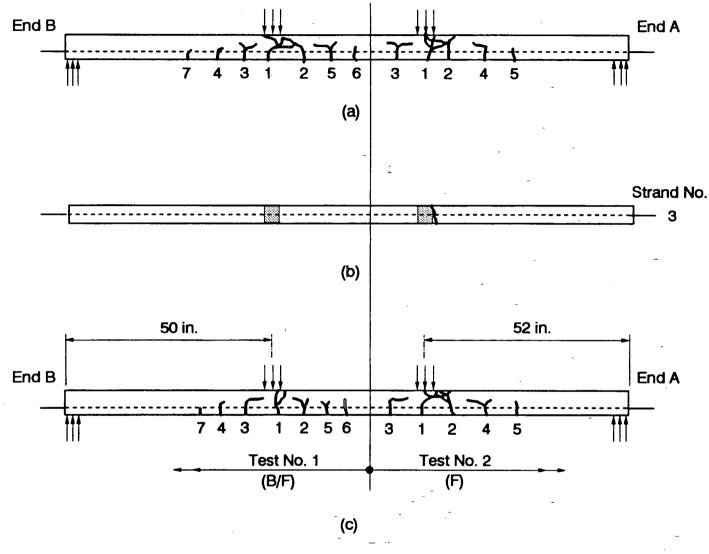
Crack patterns for D-type Specimen No. 11-6.0DU-3:
